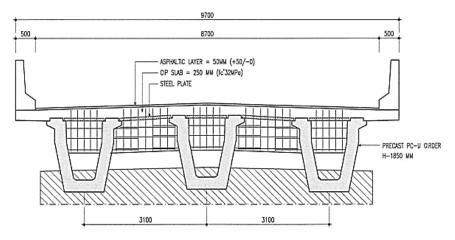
Section profile of 40.8 PCU bridge Source: DED of 40.8 m PCU Bridge (2023)
